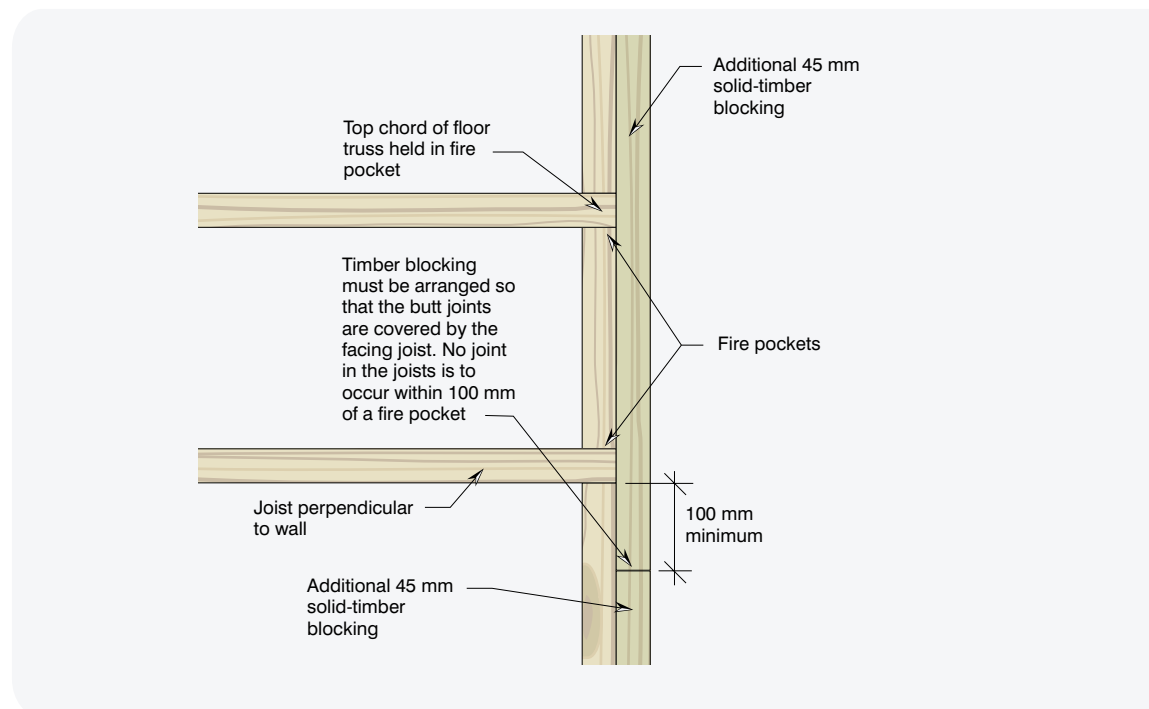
Floor-truss top chord supported in the pocket – FRL 60 minutes – plan view.
